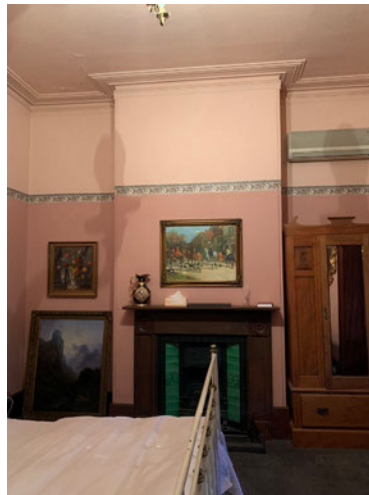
Existing bedroom 1. A new door opening is proposed to the left of the fireplace.
